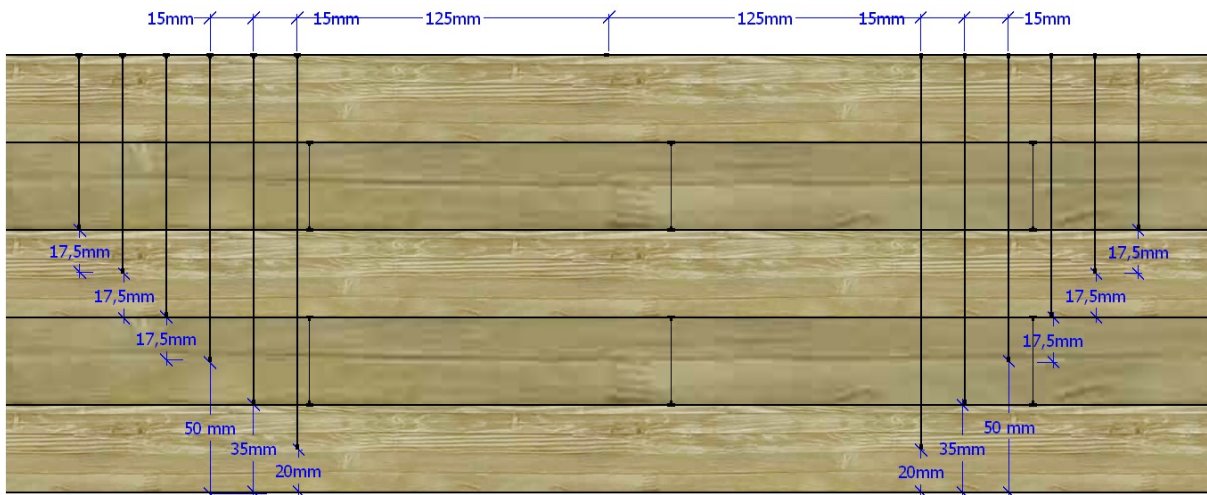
Side view of the specimen (front/back), with the positioning of thermocouples.
